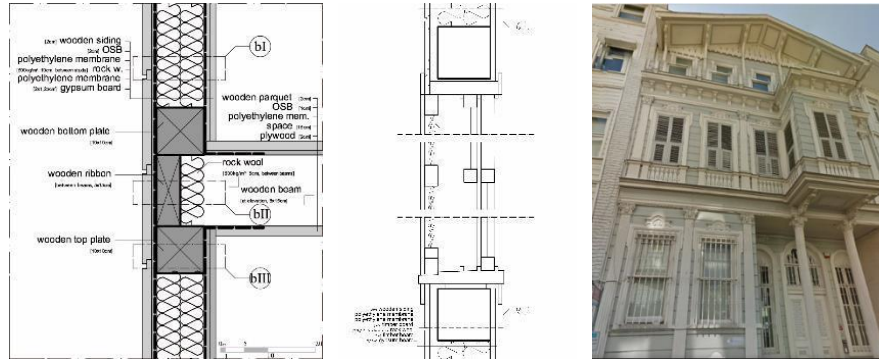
Detail section drawings of; the floor external wall knot, and the window, used in timber reconstructions.
